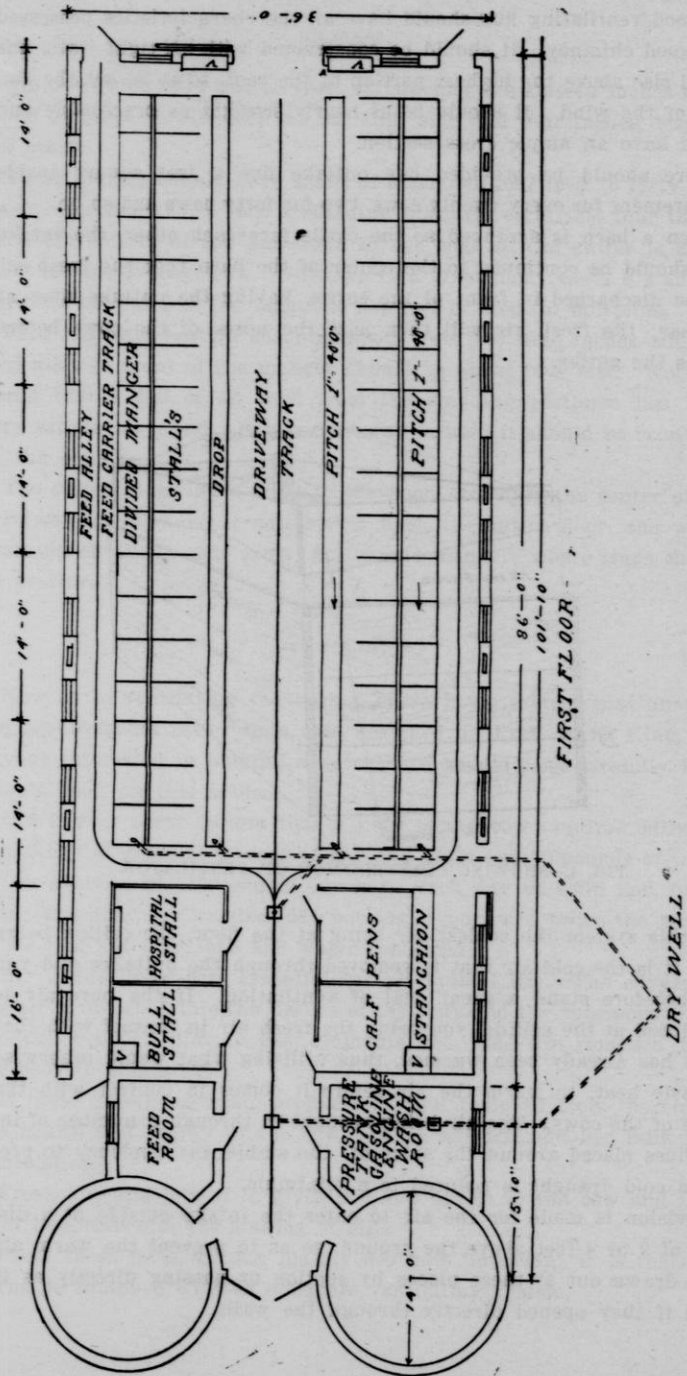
SHOWING ARRANGEMENT OF BARN WITH COWS FACING OUT.
